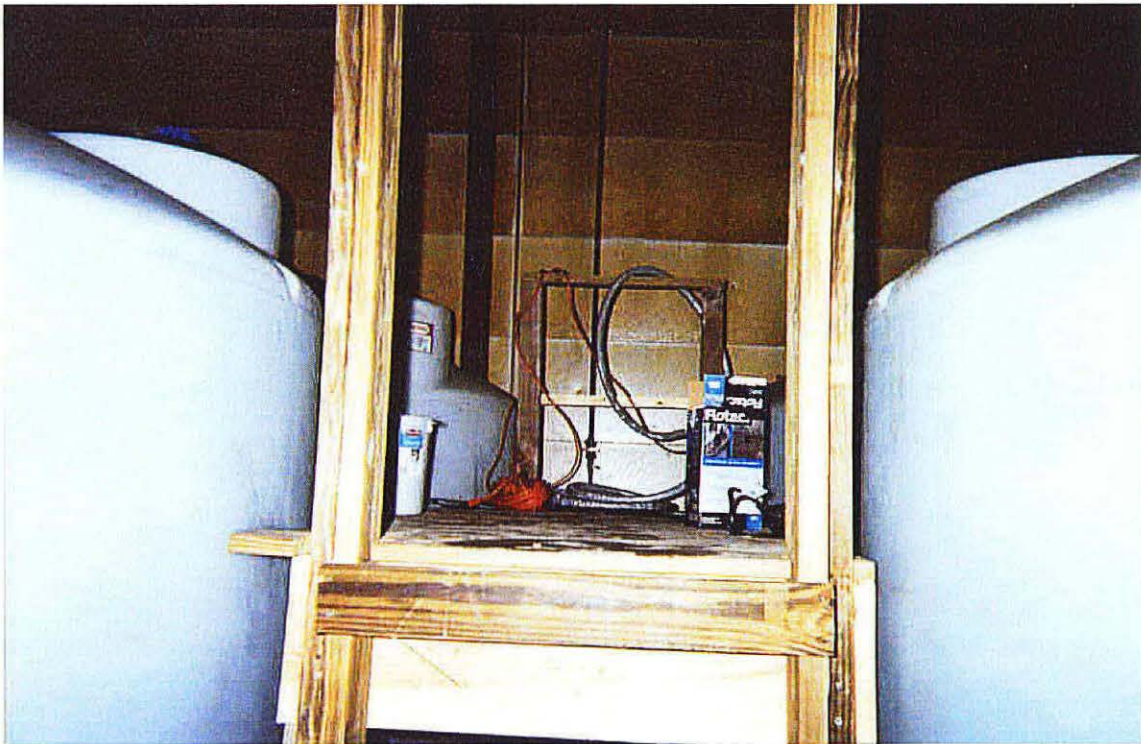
Looking west, picture of the access platform and ladder taken from ground level.
